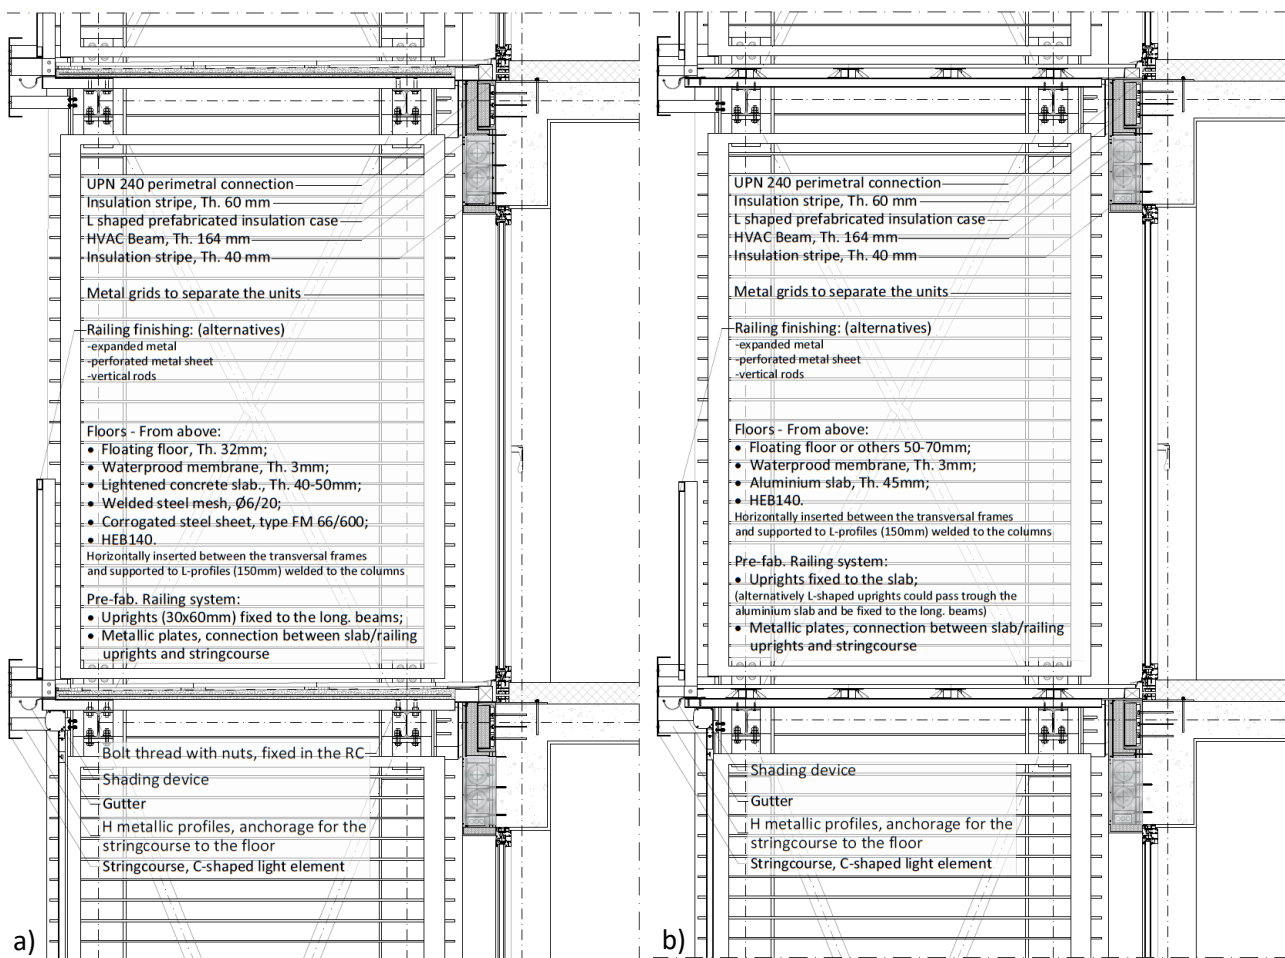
a) Vertical cross-section showing the technology provided for the balcony solution with CSS and LW concrete slabs; b) vertical cross-section showing the technology provided for the balcony solution with aluminium slabs
